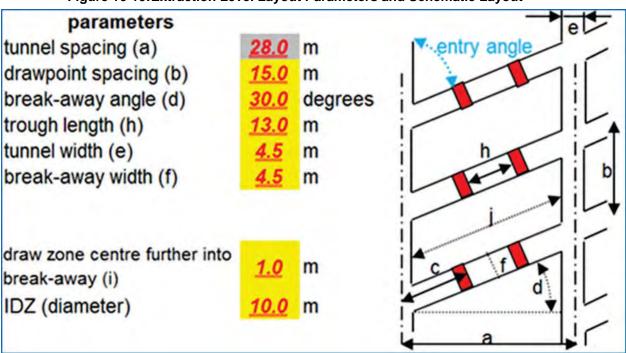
Extraction Level Layout Parameters and Schematic Layout
